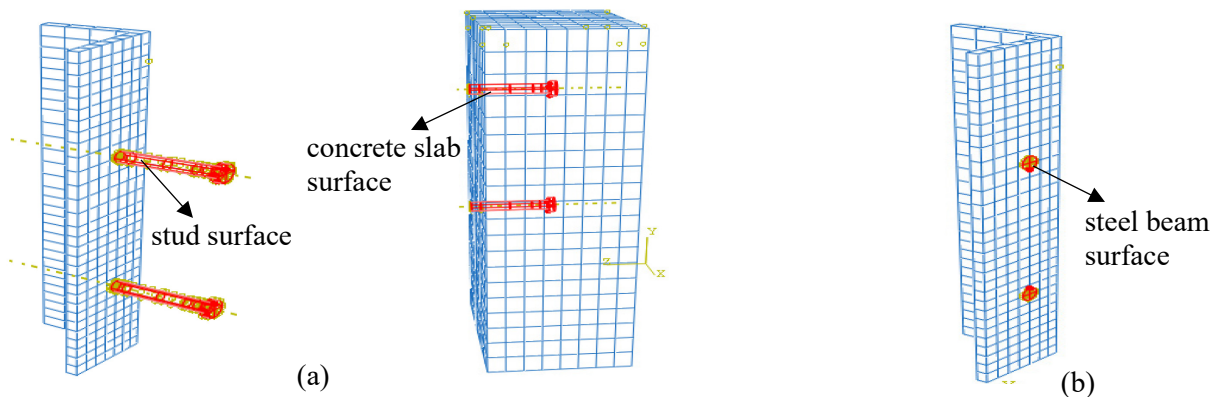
Constraints used in FE analysis; (a) surfaces in tie constraint between concrete slab-stud, (b) steel beam surface used in tie constraint with shear stud
